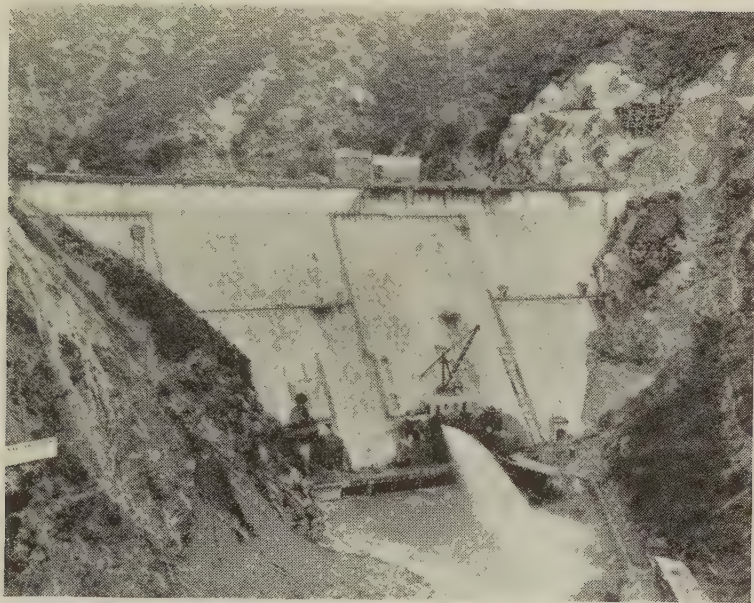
DOWNSTREAM FACE OF PINE CANYON DAM, SHOWING SPILLWAY AND CONTRACTORS' PLANT. RESERVOIR LEVEL OF 165 FEET BEHIND DAM. (SEE OPPOSITE)
